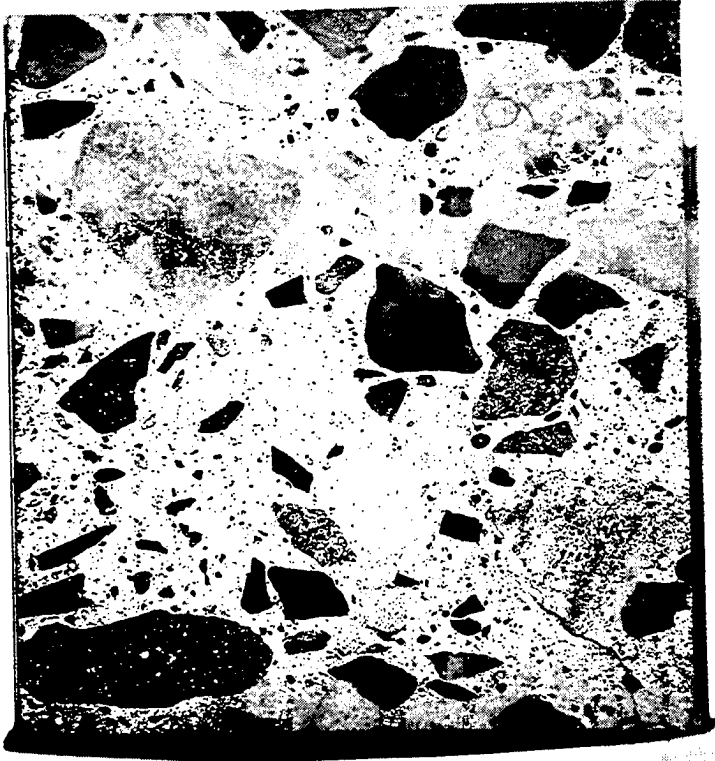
Sample 950628 shows cracking is continuous throughout the entire length of core. Both samples are 6 in. (152 mm) left to right
